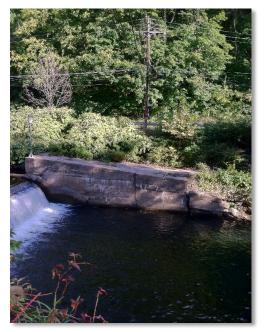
Image of foundation under 3rd Street bridge, adjacent to The Spot.
